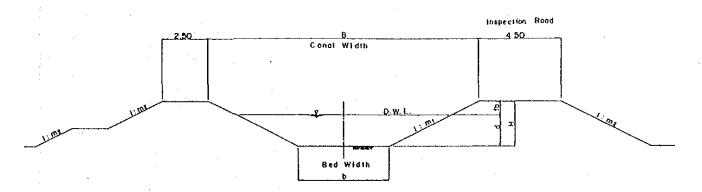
Typical Cross Section of Proposed Main Canal
